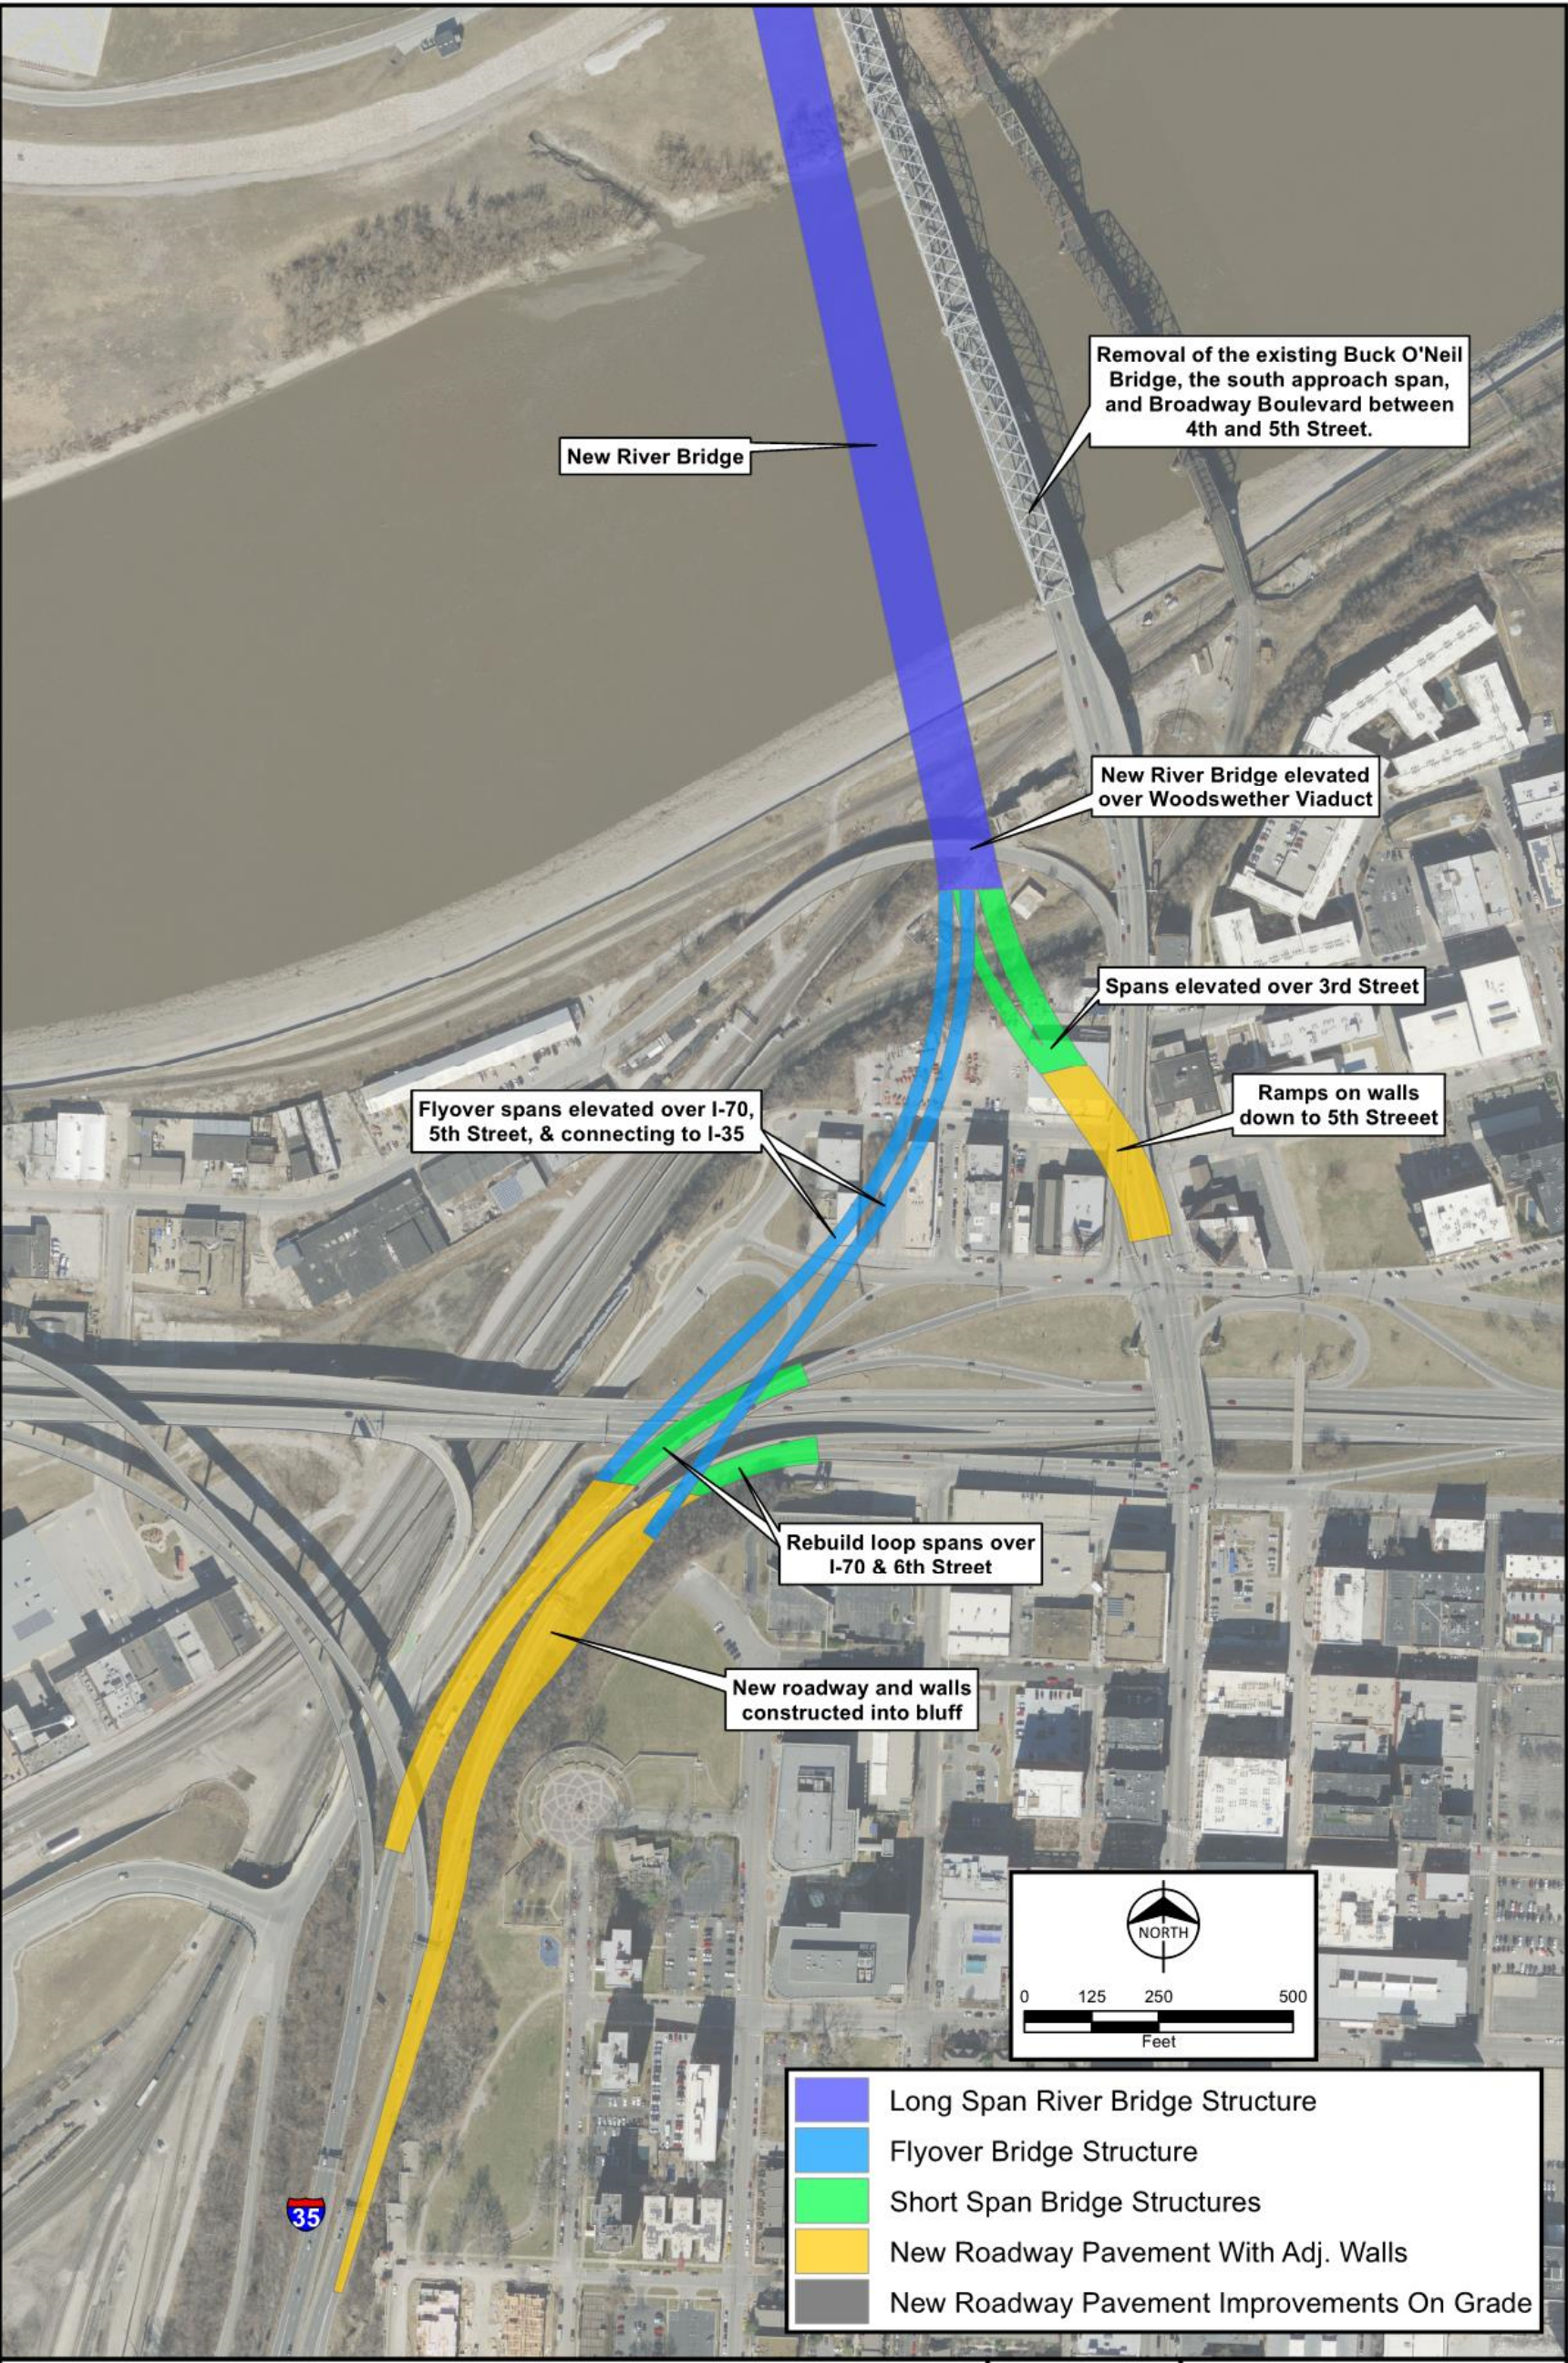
West Alternative –Bridge Alignment and South Segment Improvements
